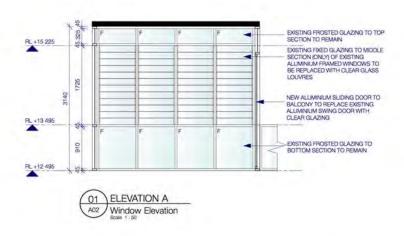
Internal Elevation showing proposed louvres with RL's
